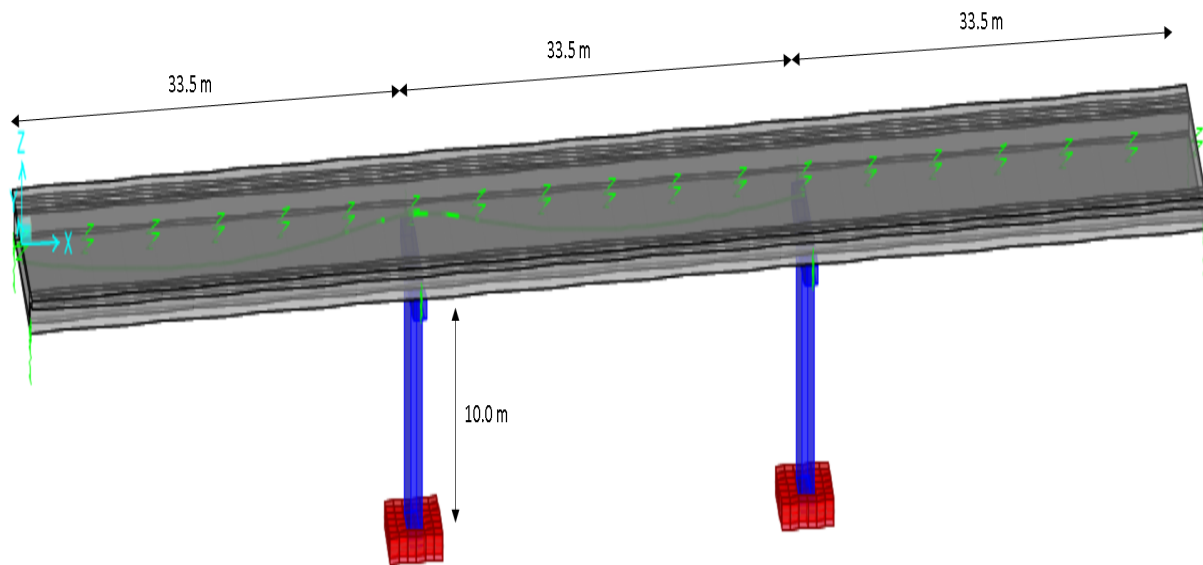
Finite element of a reinforced concrete (RC) bridge
